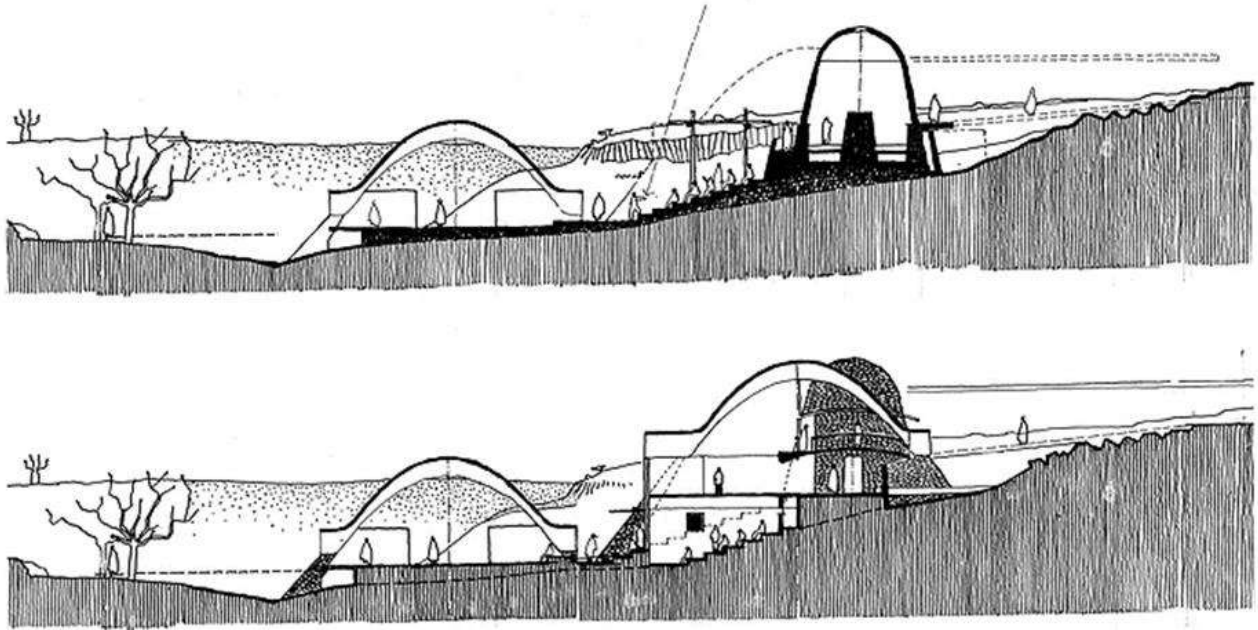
Longitudinal Section through the building. (Archdaily search. Accessed 23/10/2019).
